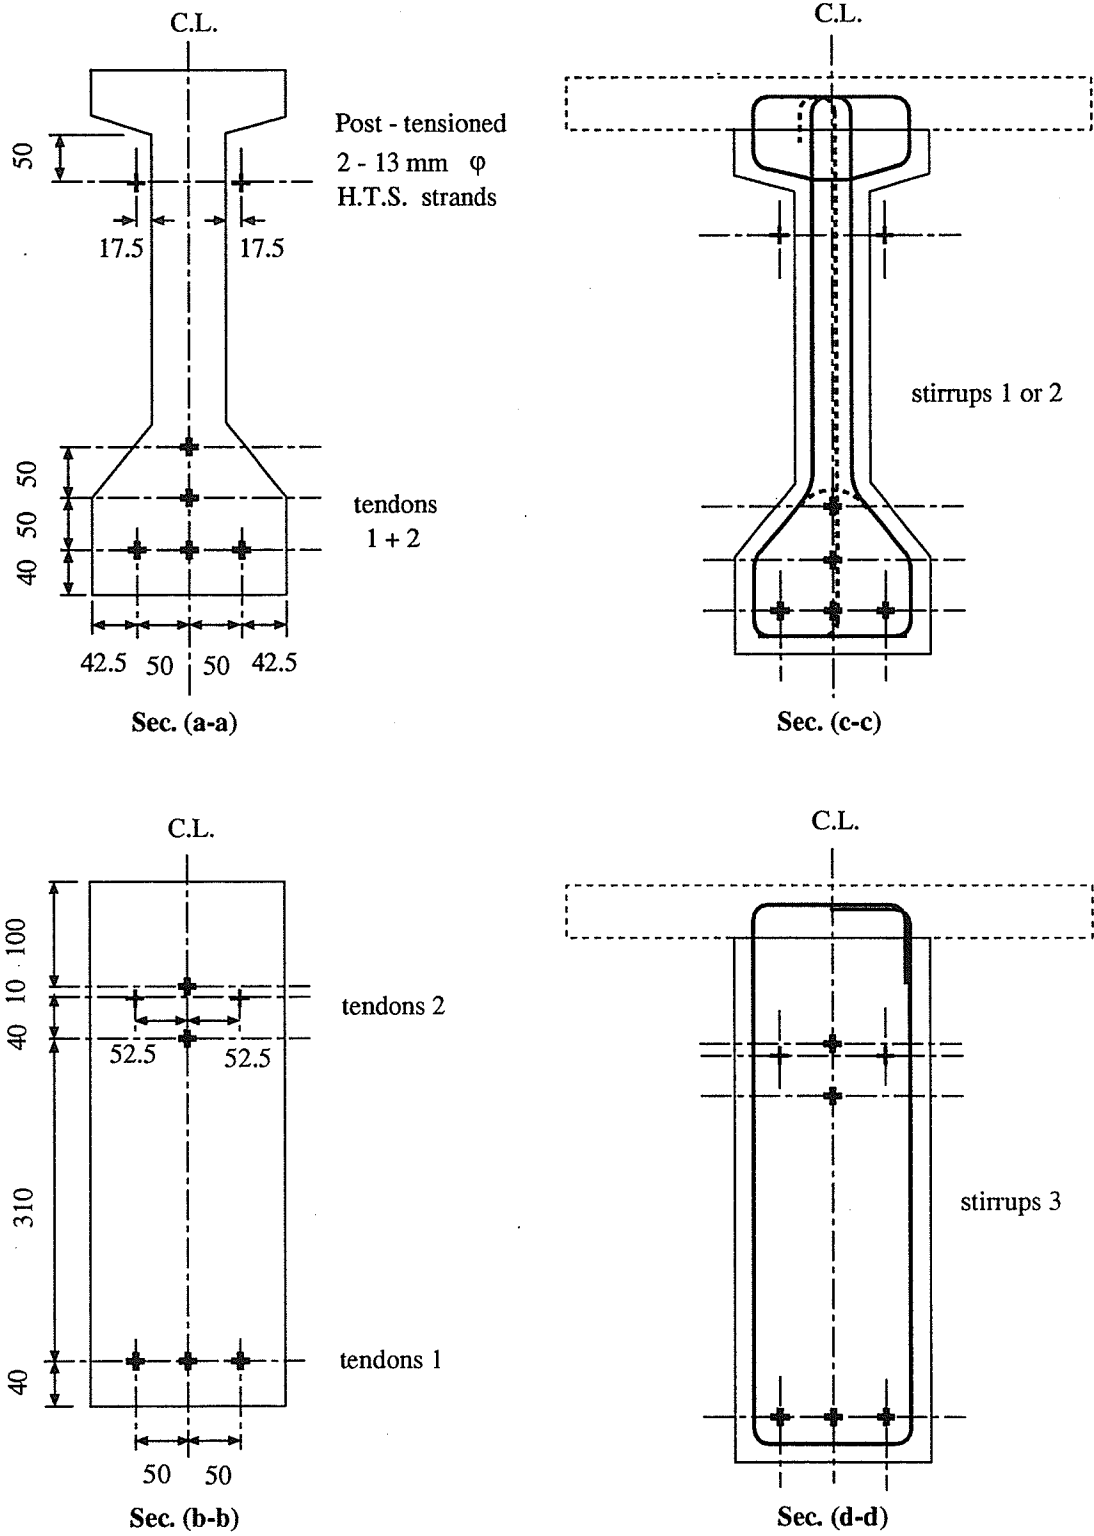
(Cont.) Prestressing and reinforcing details of test beams
